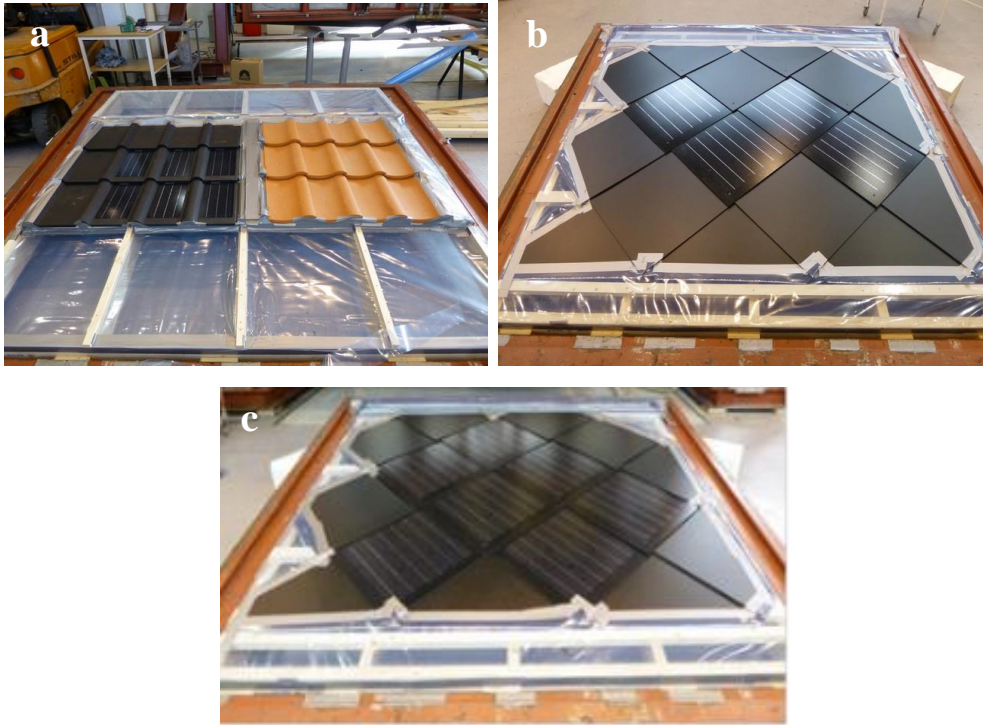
Roof systems tested by Andenaes, (a) solar roof tiles and conventional roof tiles, (b) solar shingles in two configurations with four solar shingles and (c) seven solar shingles surrounded by dummy shingles from the same manufacturer [115].
